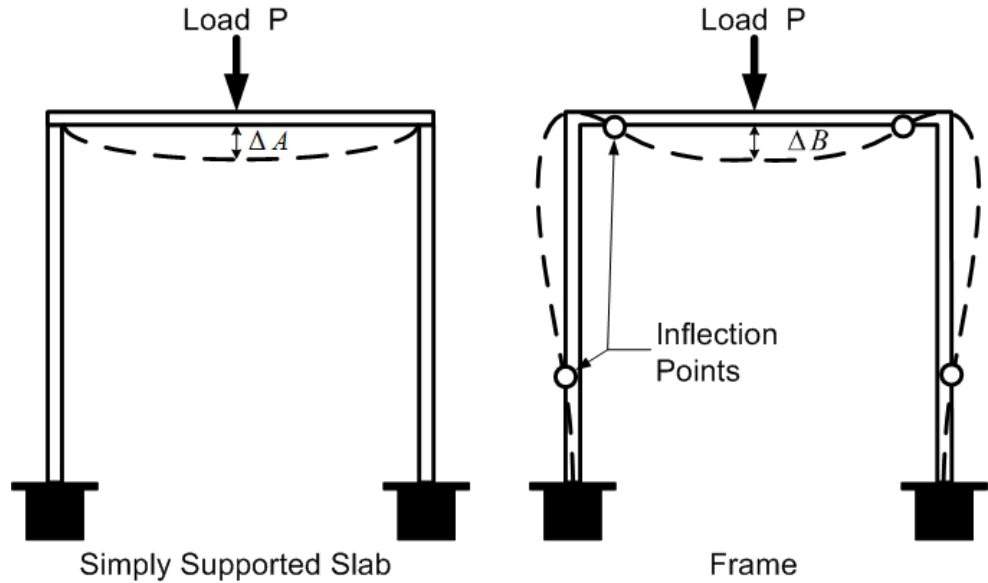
Deflected Simply Supported Slab versus Deflected Frame Shape
